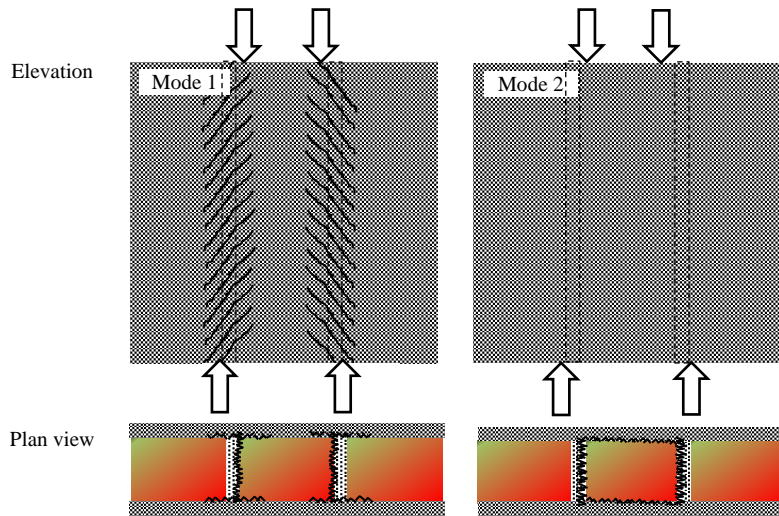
Failure modes illustrated on masonry triplet specimens with SHCC overlays.
